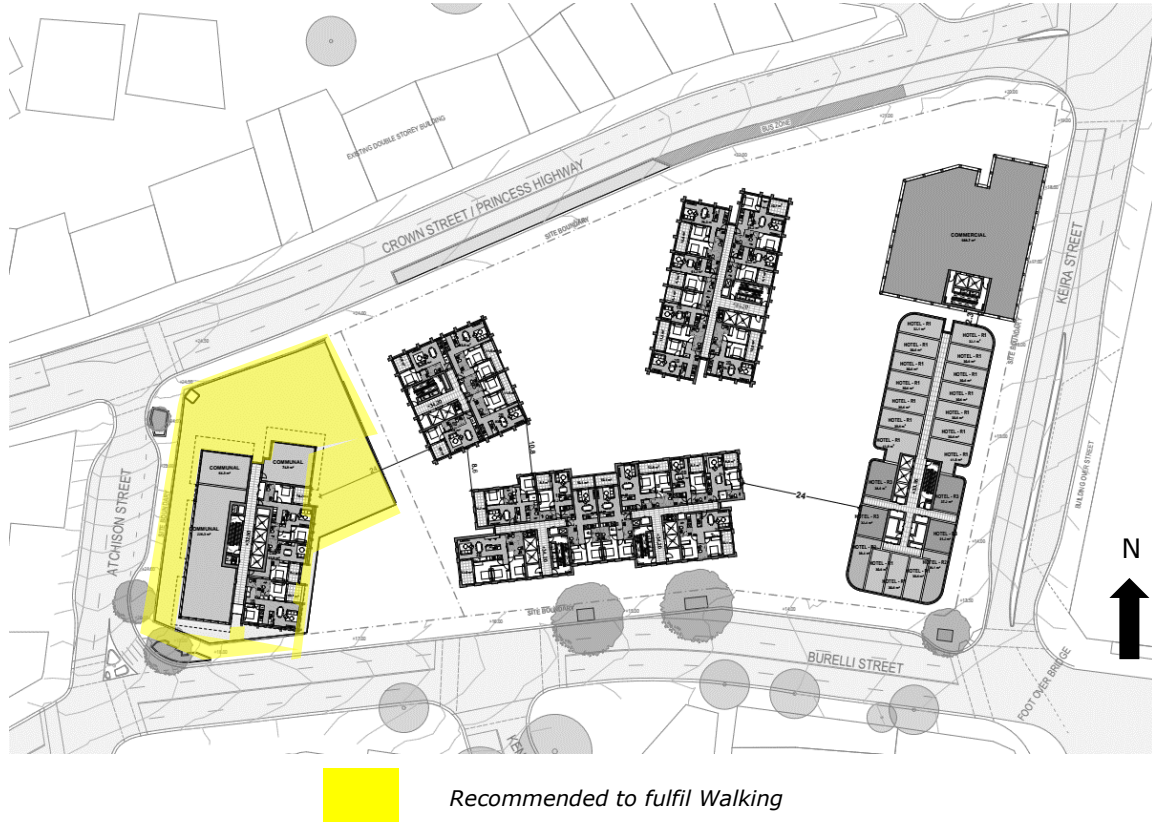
Level 4 floor plan with the recommended wind criteria overlaid (Feb 2025).
